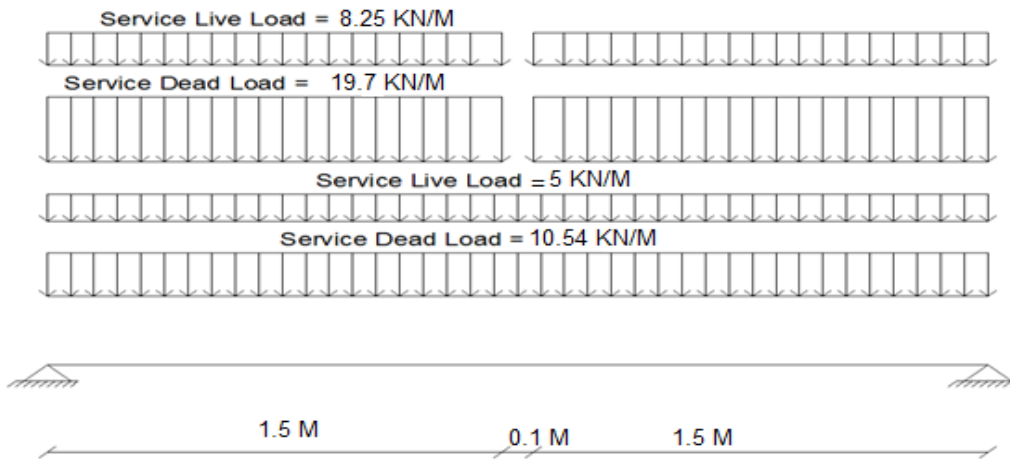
Statically System and Loads Distribution of Main Landing.
